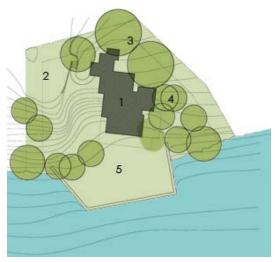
Site Plan - 1. House 2. Parking 3. Garden 4. Garden 5. Front Lawn
